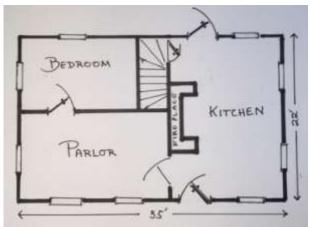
A possible floor plan for Simon Jr's house. Drawing by M. Falconer.
